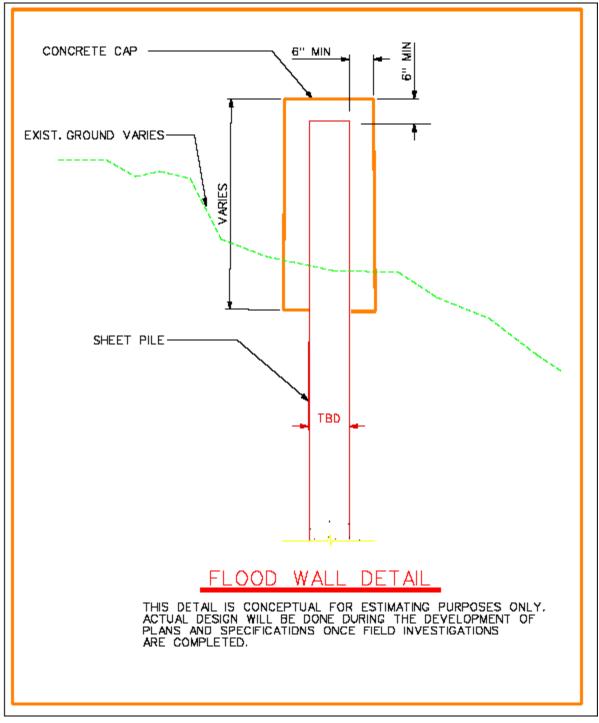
Flood Wall Tyoical Cross Section (Conceptual)
